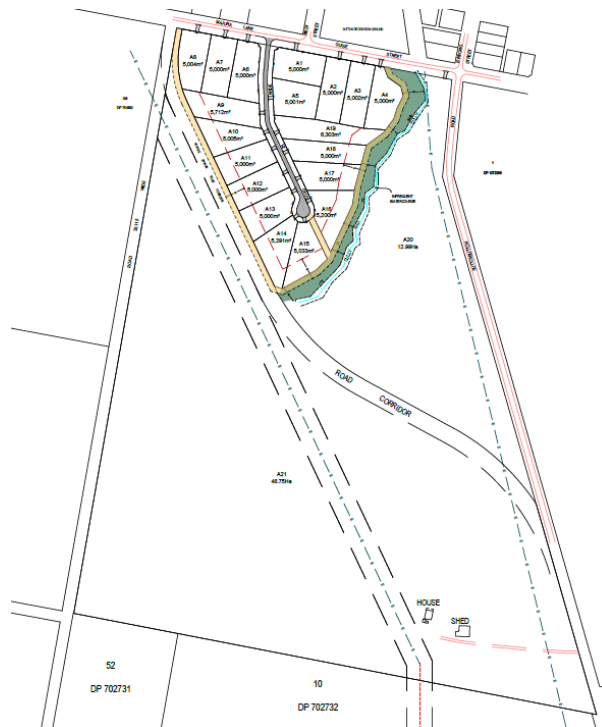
Subdivision layout – extract (refer to surveyed plans)
